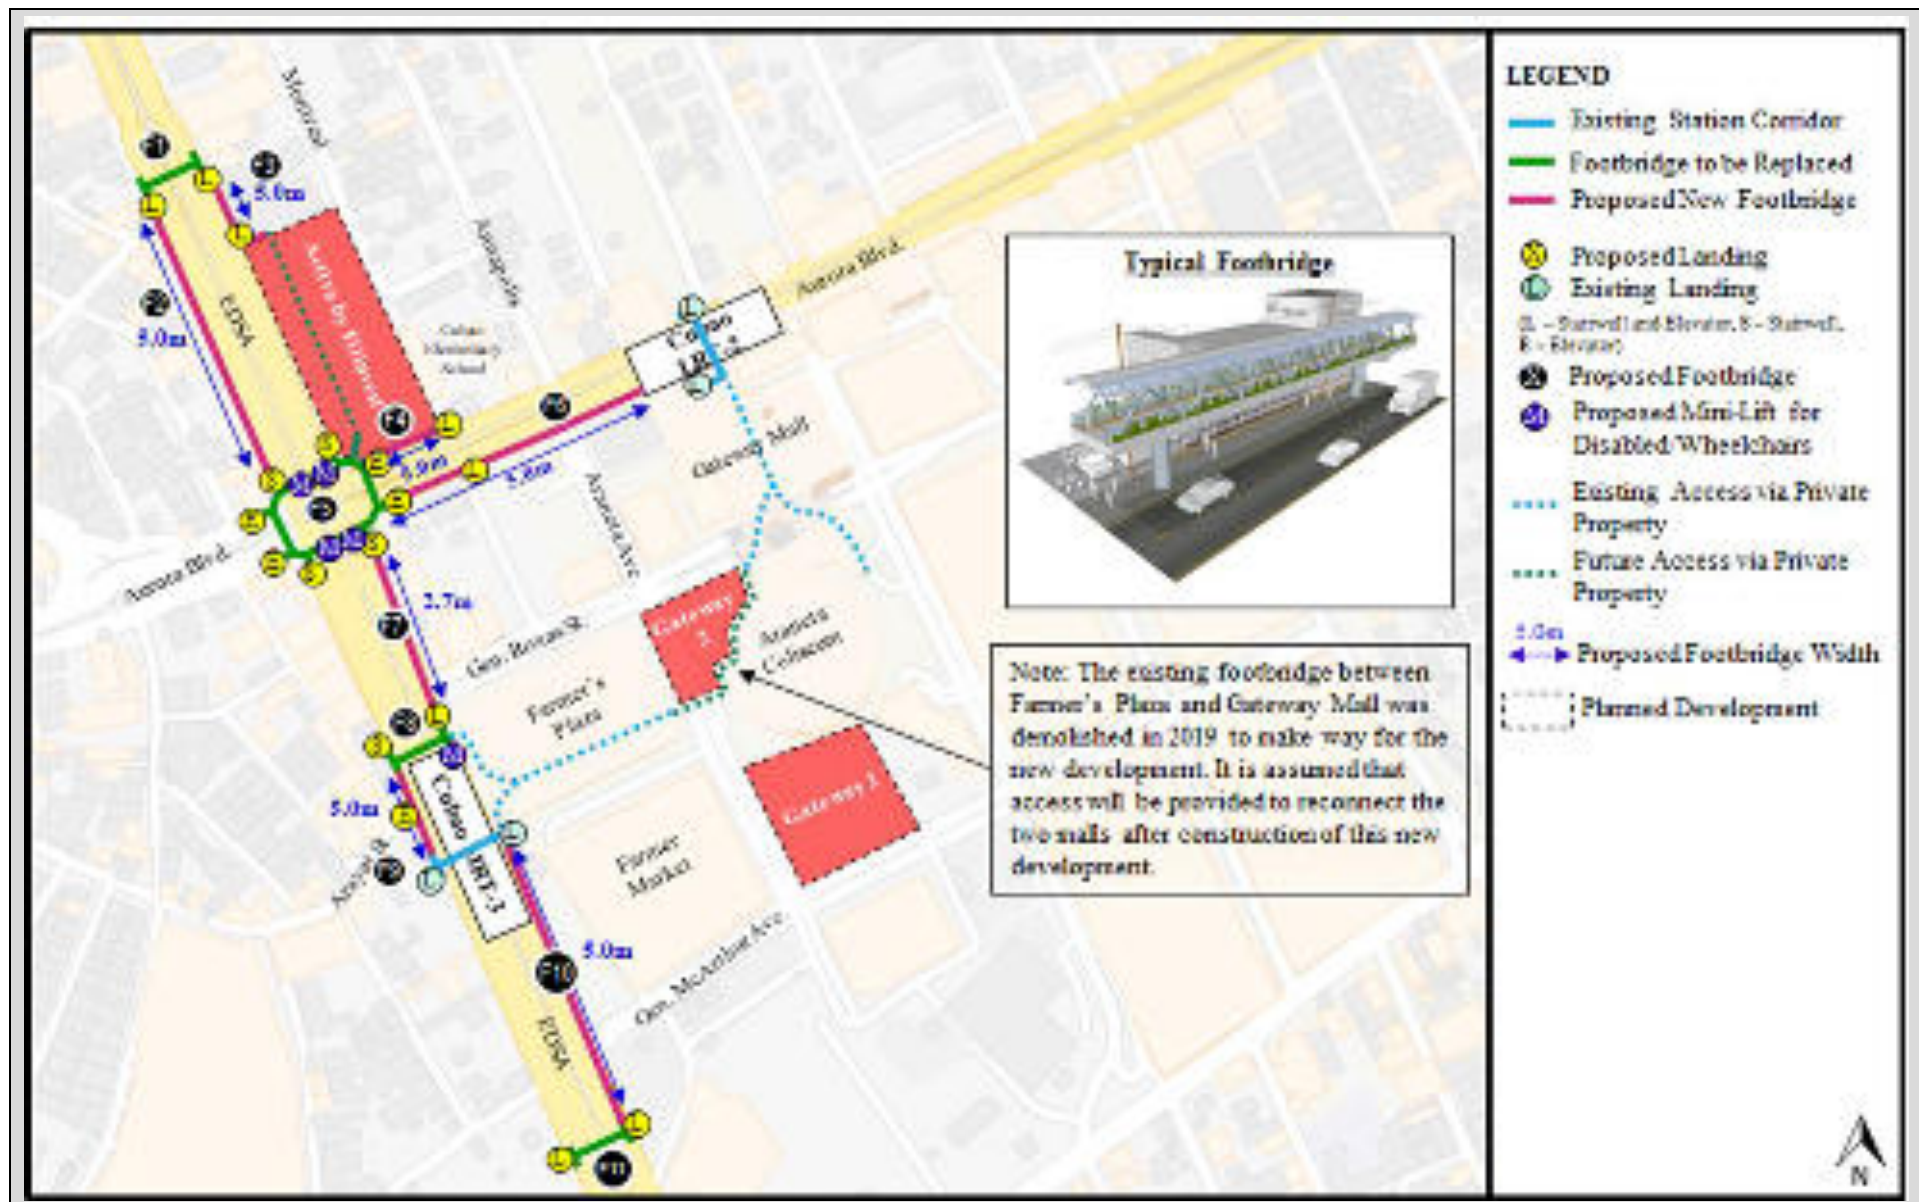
Proposed Footbridge Scheme – Cubao Station
